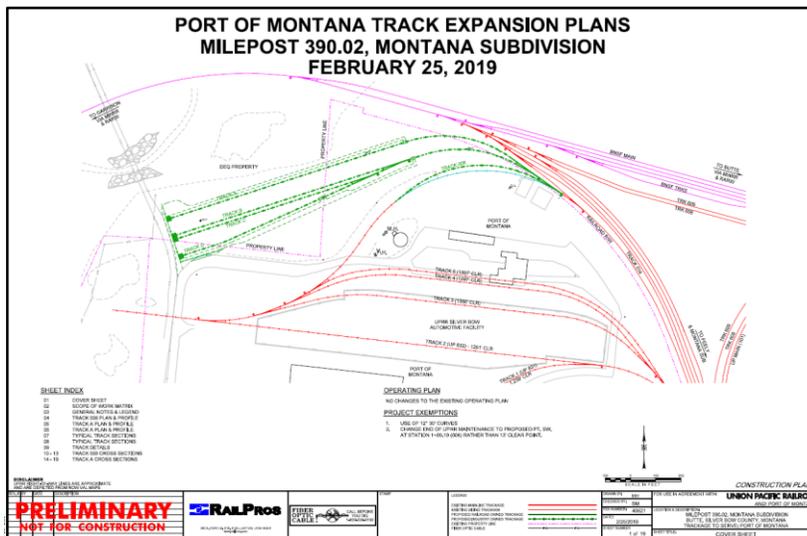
Port of Montana Facility showing current tray layout as well as proposed track expansion.
